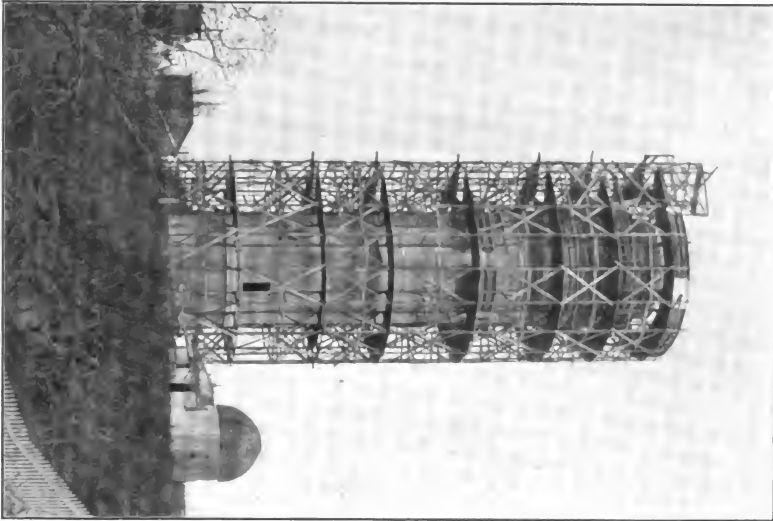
SCAFFOLDING FOR WATER TOWER.
